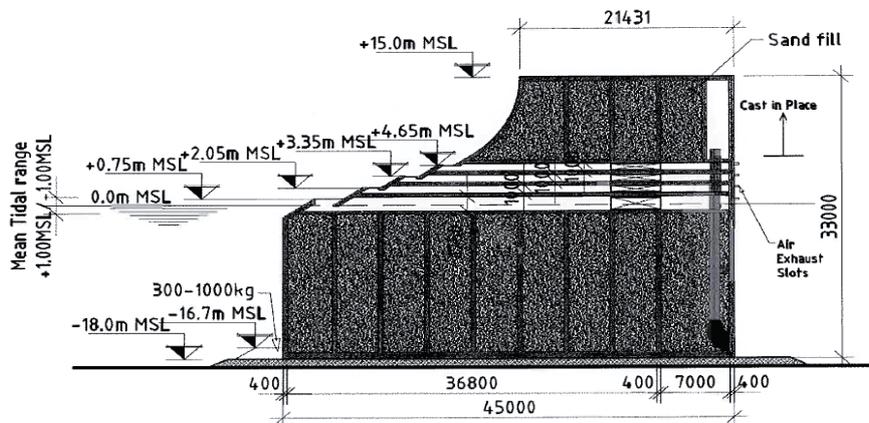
of the SSG-breakwater caisson at Sines 18 m water depth (DMC 2008).
